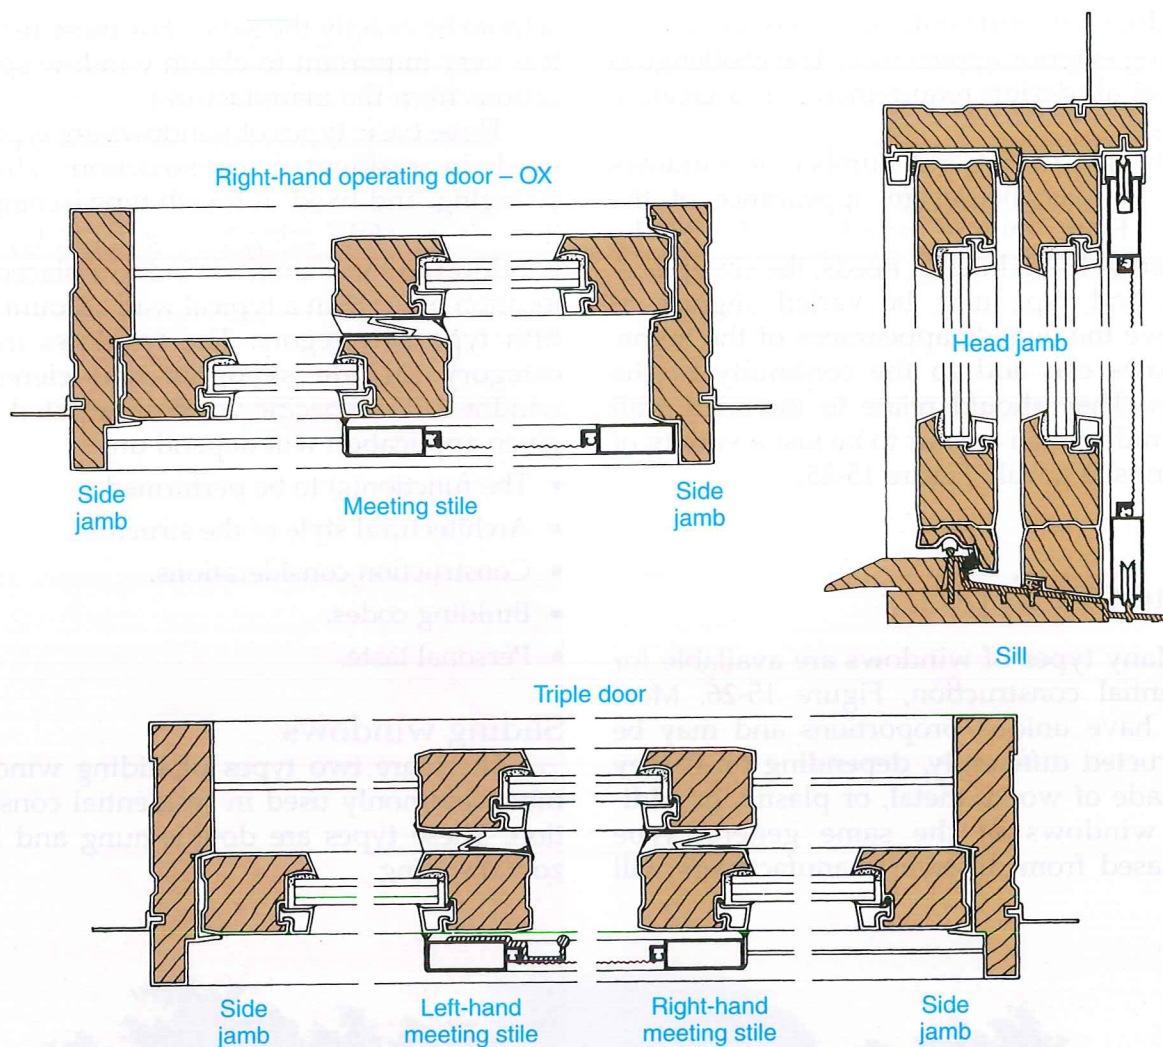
Details for sliding glass doors are more complex than for other doors.
